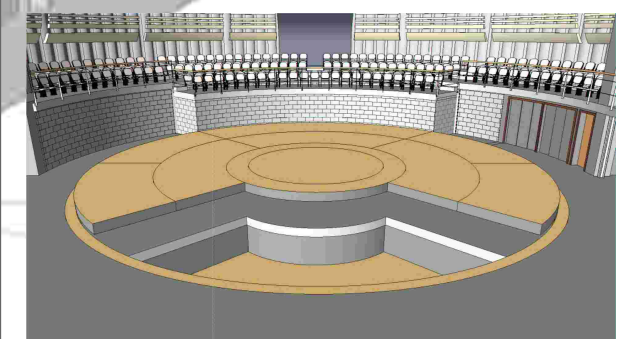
Orchestra pit sunken, stage arranged to engage audience
